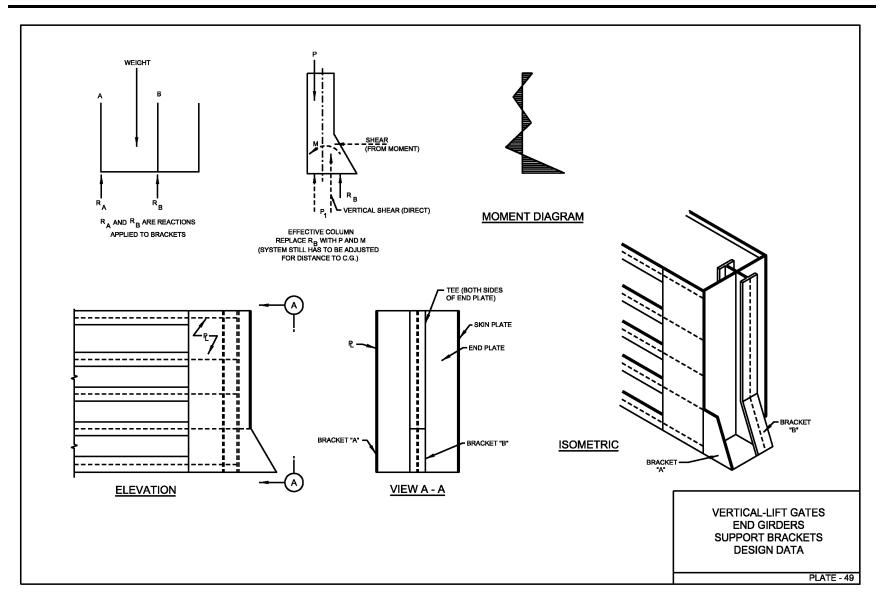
Plate 49: Vertical-lift gates, end girders, support brackets, design data
